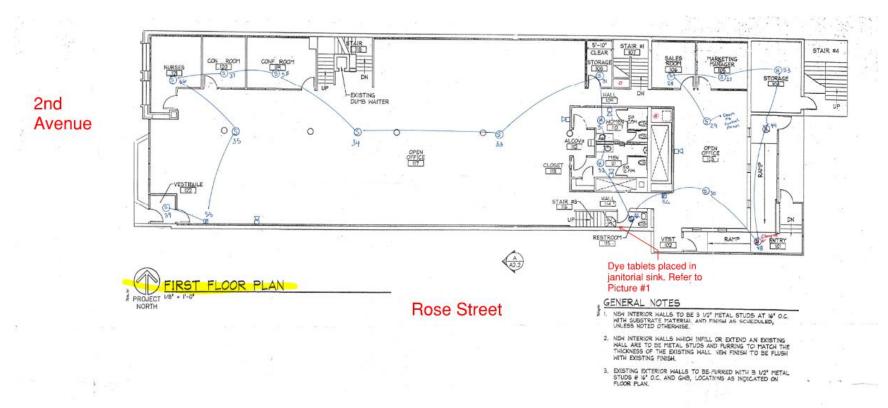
1998 floor plan for the first floor of the 106 N. 2nd Avenue building and the location of the janitorial sink and where dye tablets were placed (Source: 5/12/1998 Integrus Architecture Mechanical-HVAC Plans)
